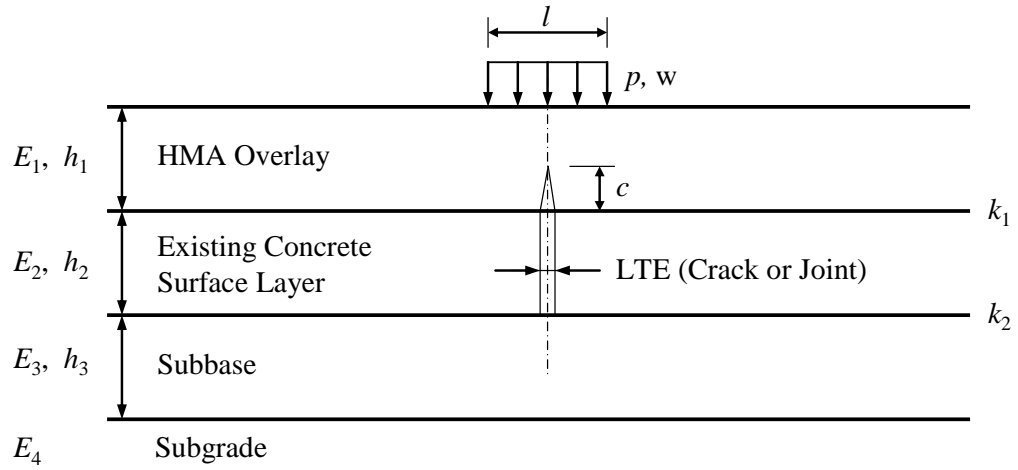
Diagram of HMA overlay on jointed concrete pavement-bending.
